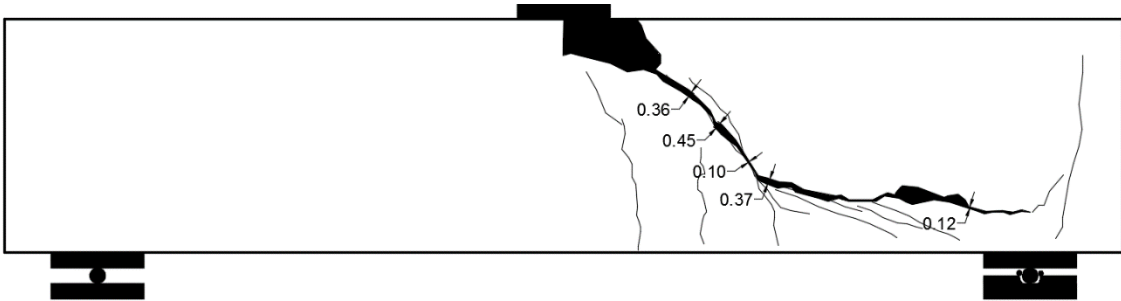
Crack pattern at failure for SNFRC 0.5% beam #30
